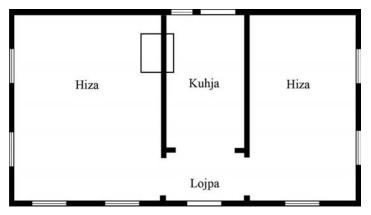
Floor plan of a typical Zagorje house. A tiled-stove heats the main "hiza" and backs onto the raised kitchen fireplace ("komen"). Plan courtesy of Jeffery Harris.
